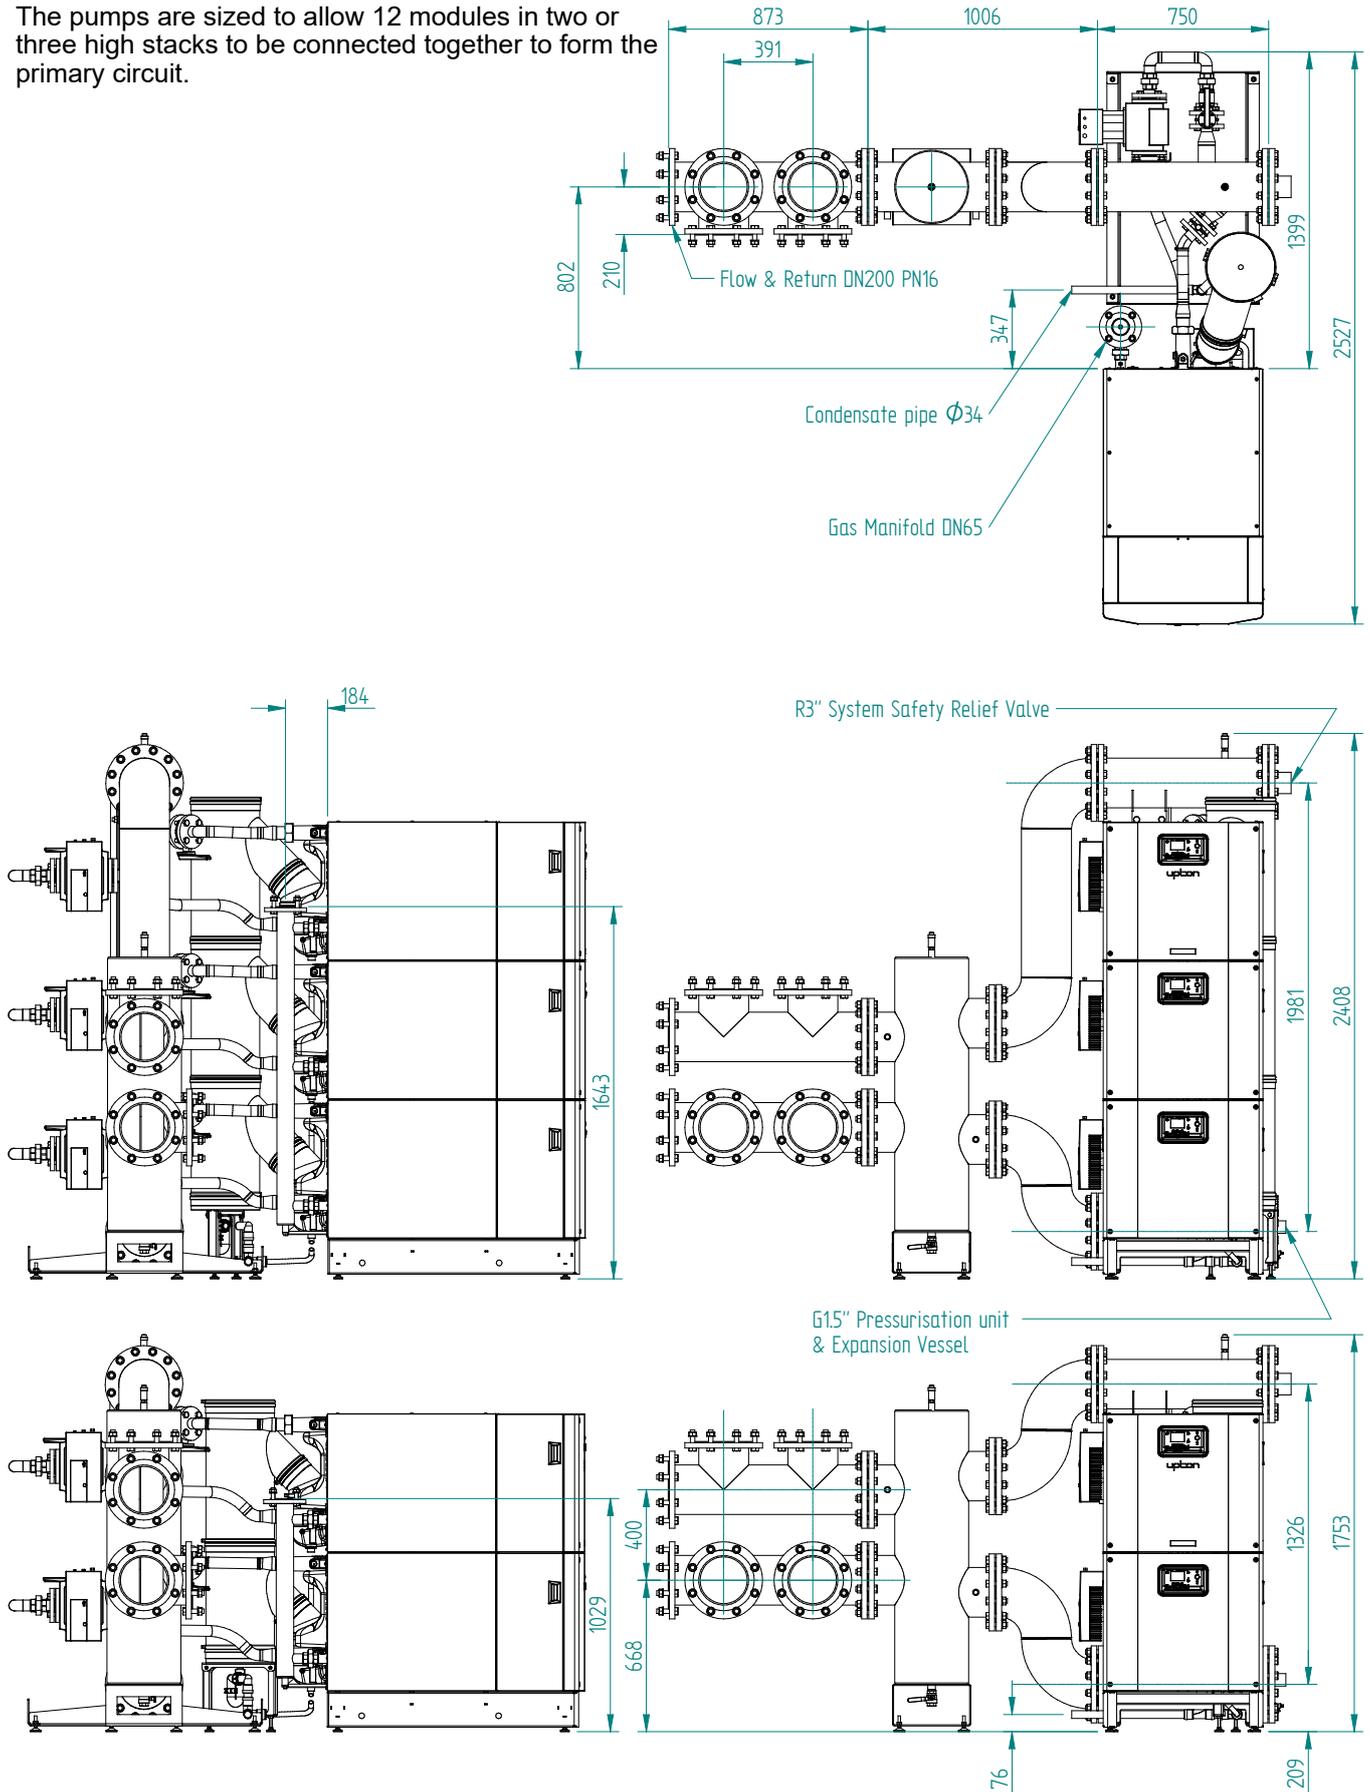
UF300 & UF350 4MW Primary circuit and Gas manifold pipe kit
